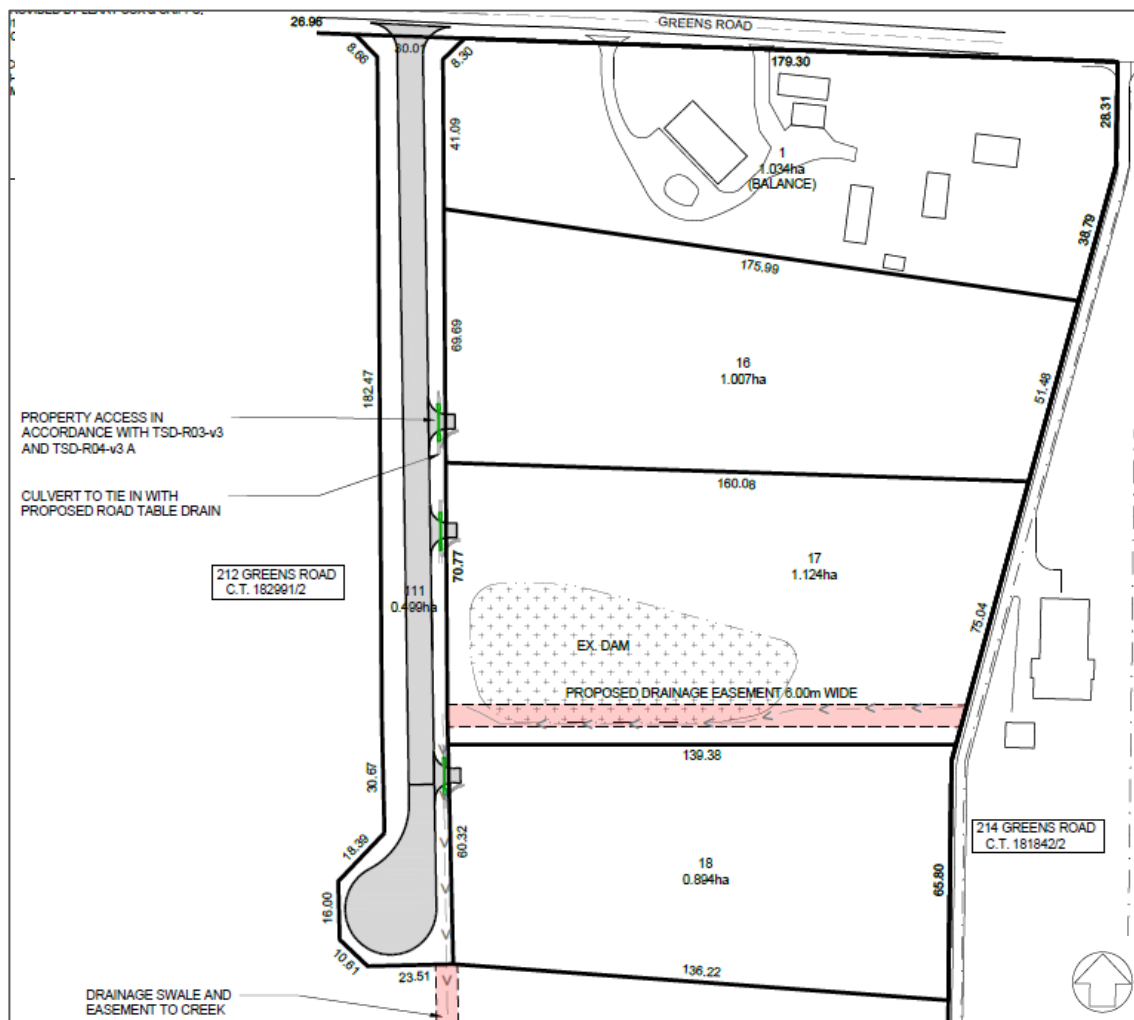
Part of Proposed Stormwater Plan C04 at 212 Greens Road, Orielton
